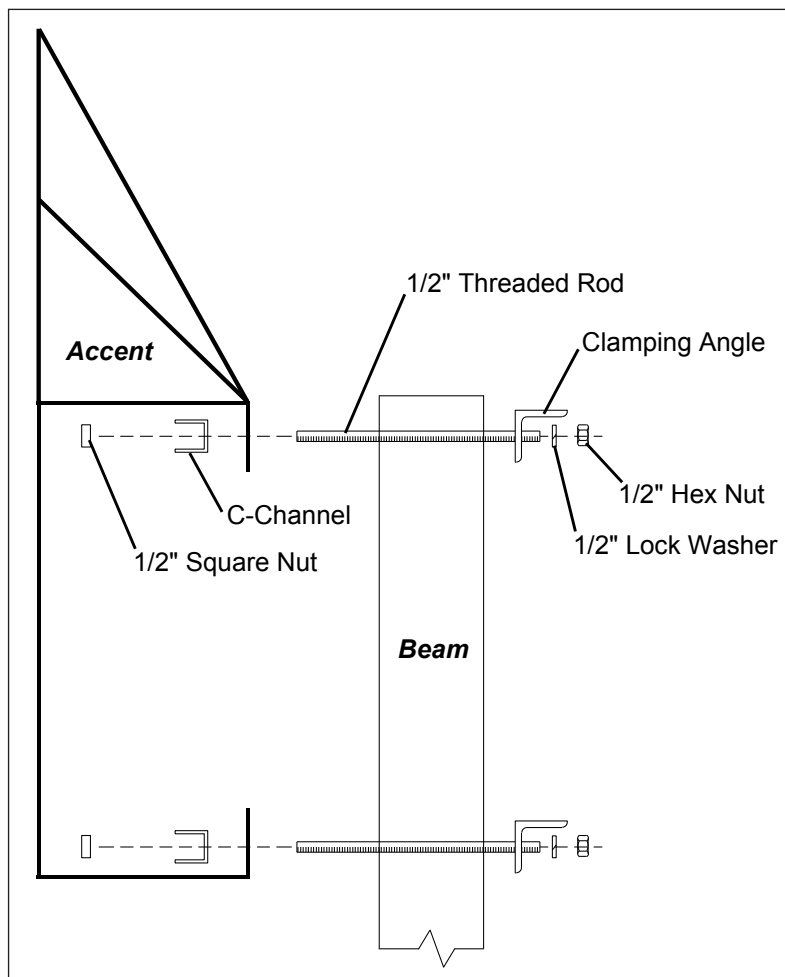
Dome Accent Mounting with Clamping Angles, Side View
